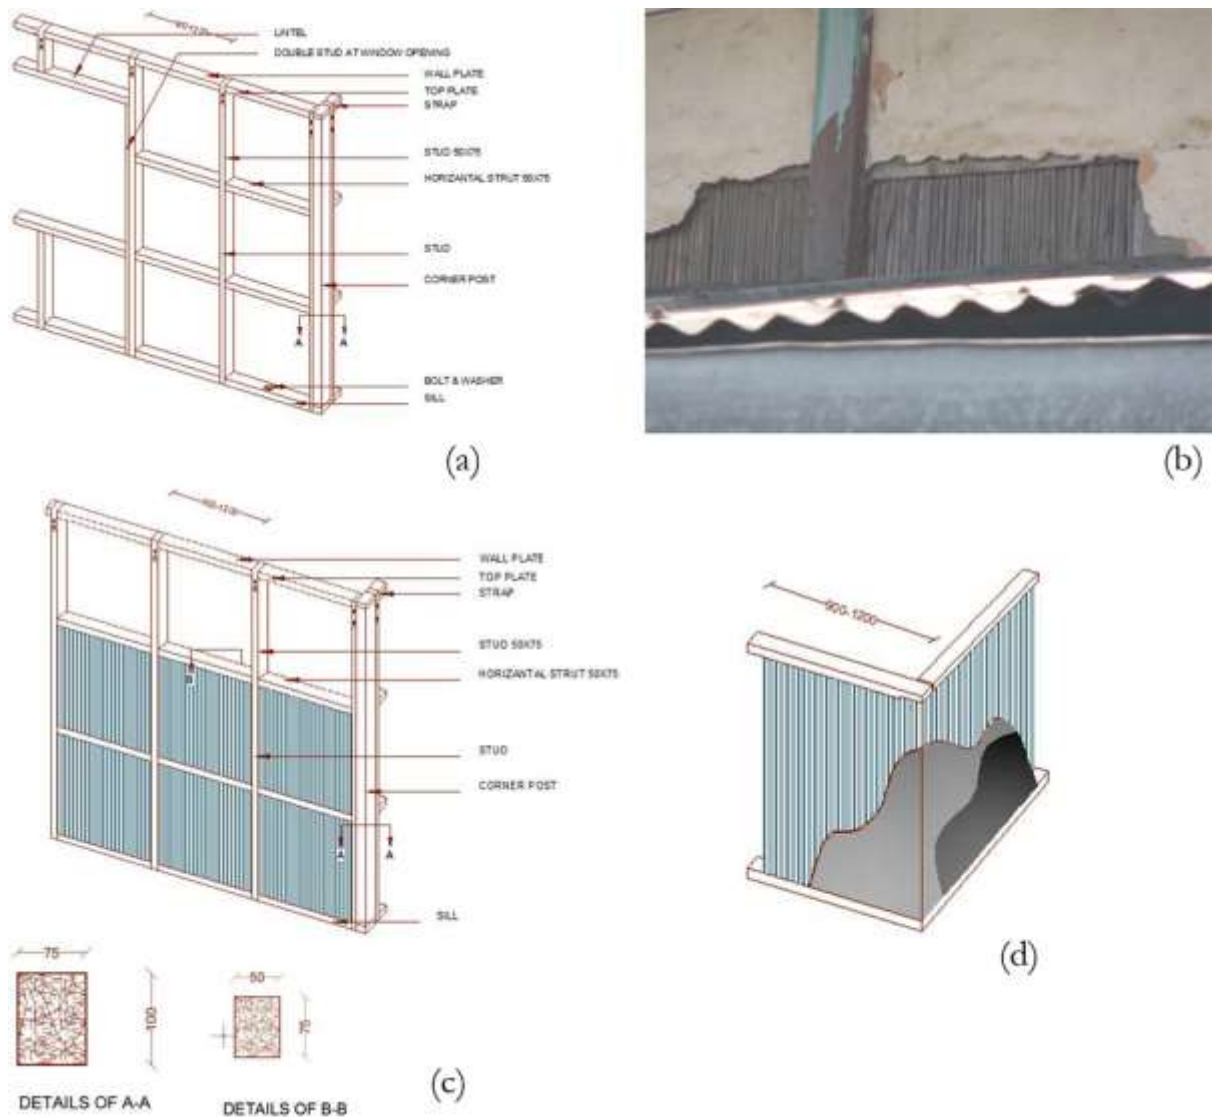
Ikra walls Construction Sequence: (a) details of framing, (b), (c) Ikra reed and bamboo mats placement in the frame, (d) plastering of walls.
